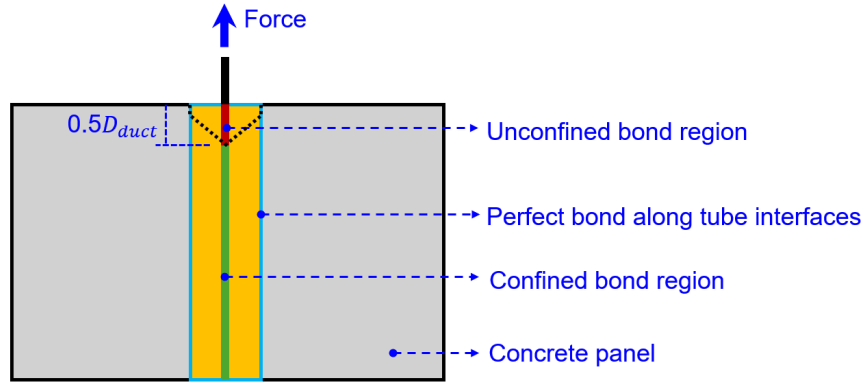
Proposed Modelling Approach for Bond Behaviour of Dowel Bars in Grout Tubes
